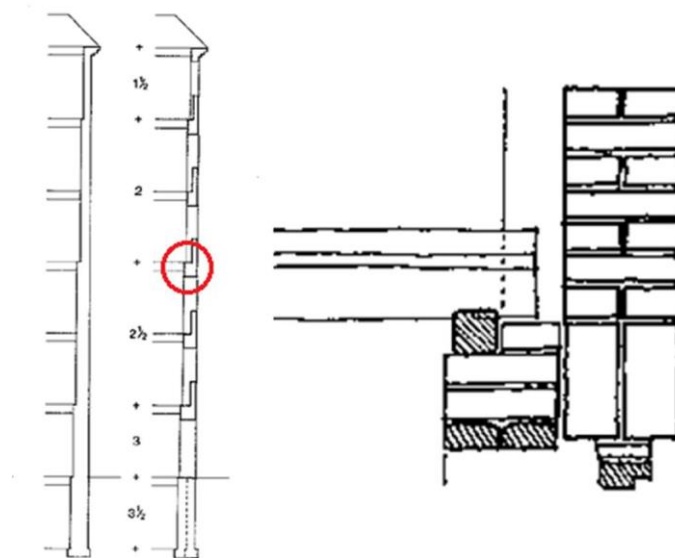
Vertical and horizontal sections of wall and floor construction [12]
